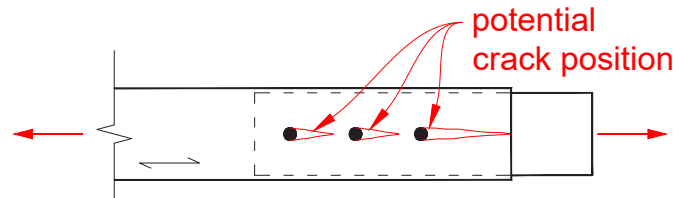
Potential failure of a joint with multiple dowel type fasteners.
